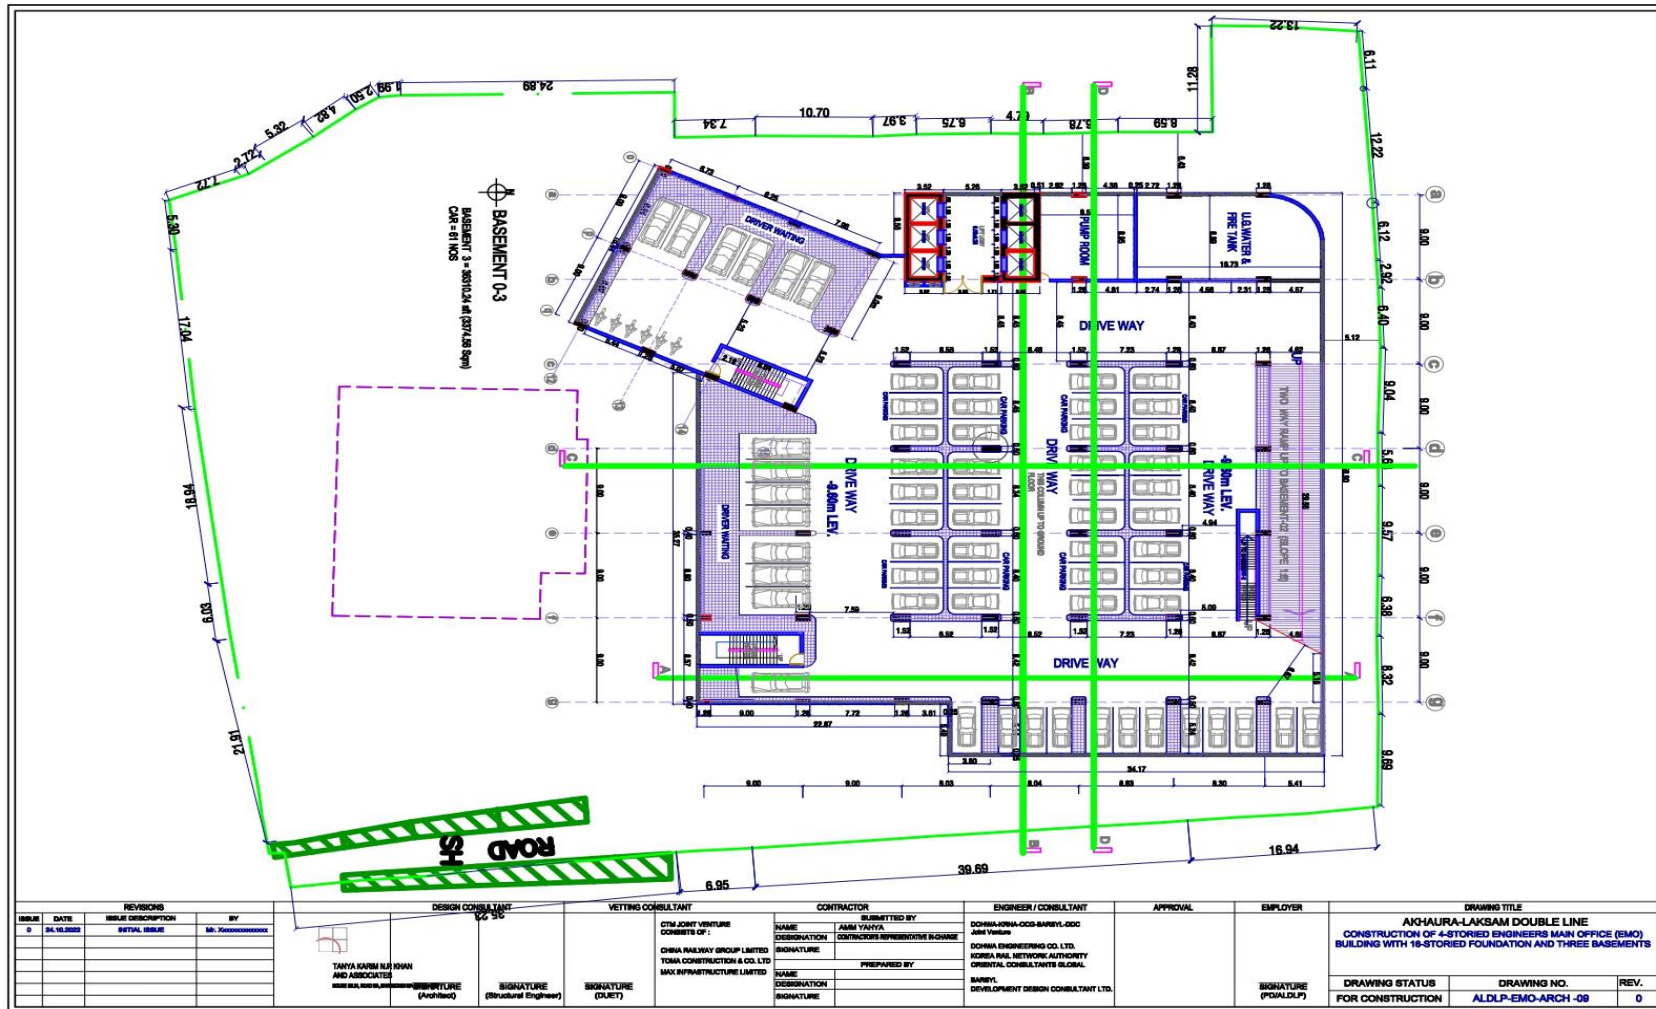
Layout Plan of Proposed EMO Building (Basement-3)
